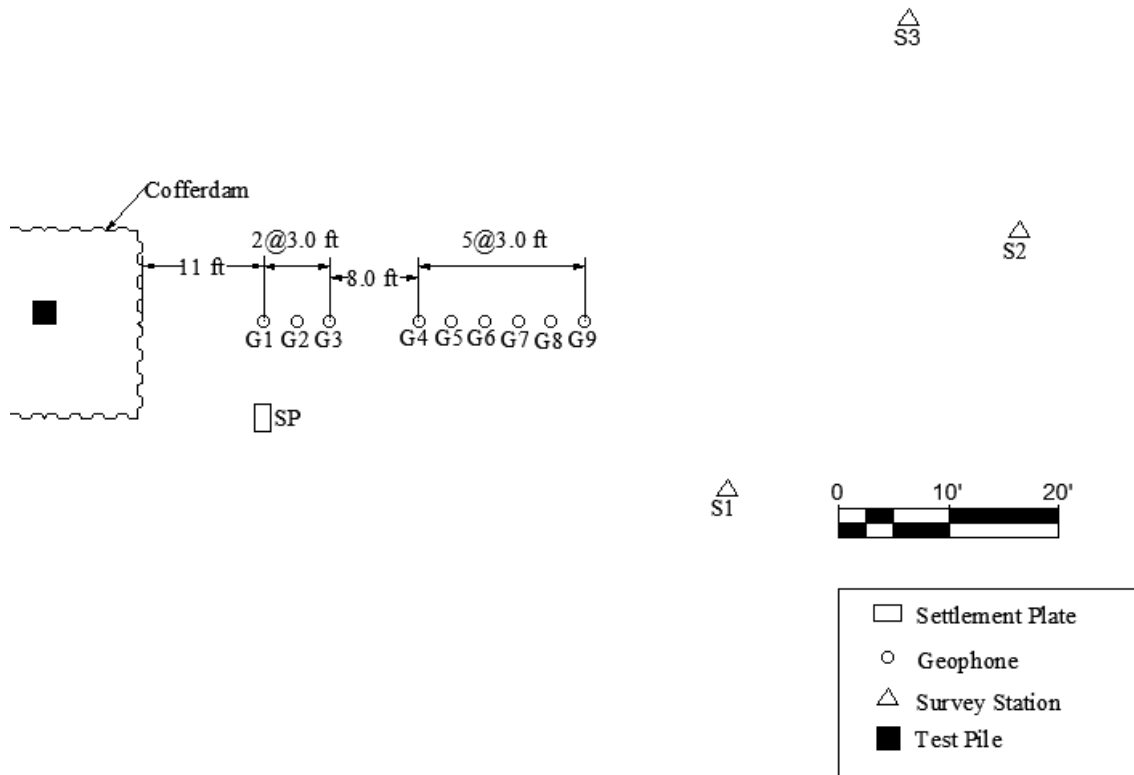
Plan view of the instrumentation layout showing location of geophones, survey nails, and survey stations used to collect data during driving of pile 12 at Site B.
